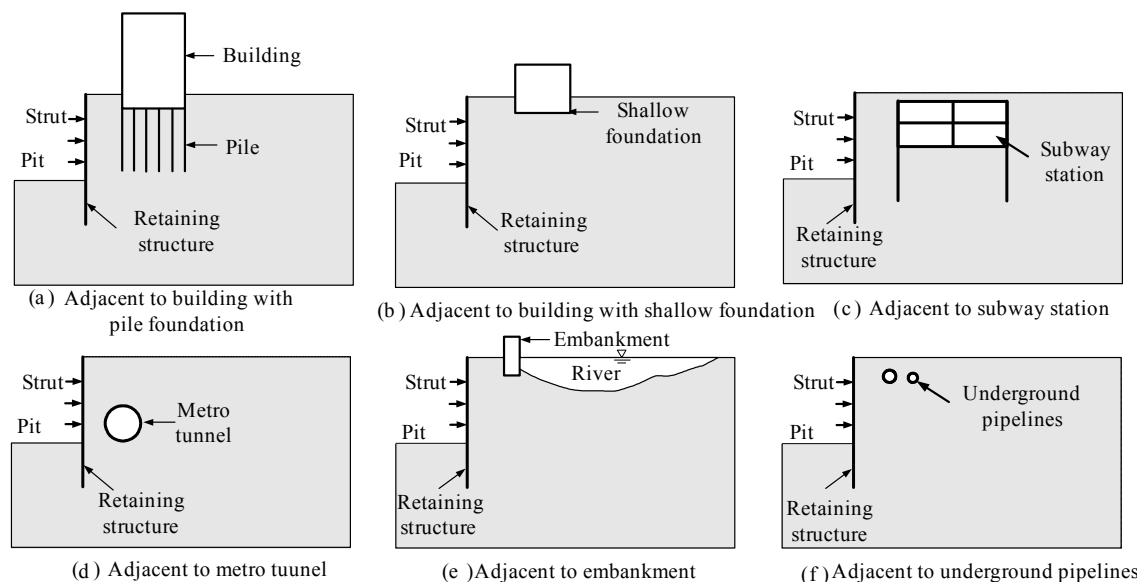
Sketch maps of typical situations of excavations adjacent to properties
